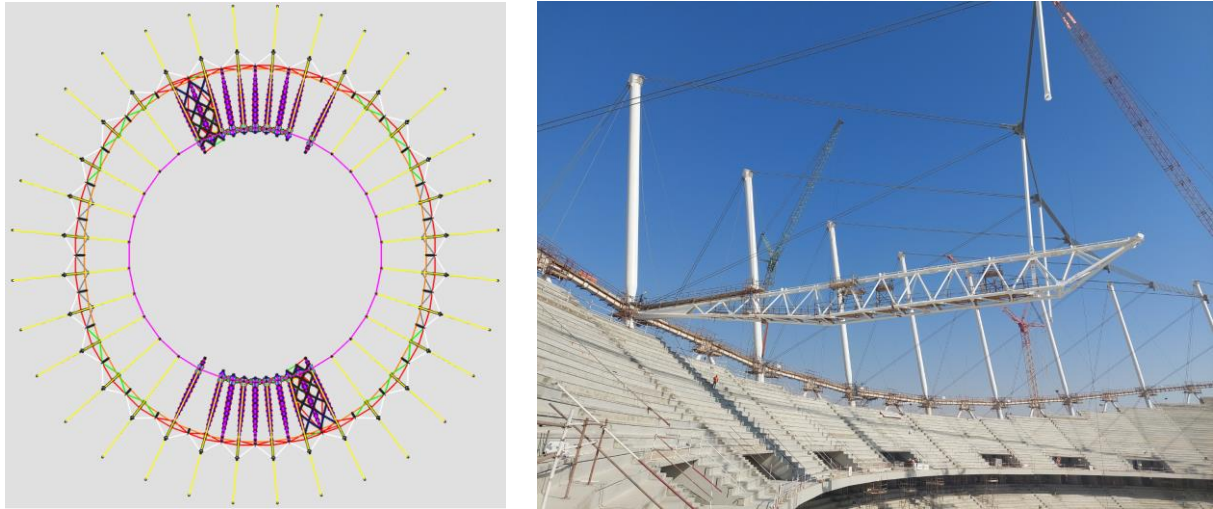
Numerical simulation and photo from the site of the radial beam installation
